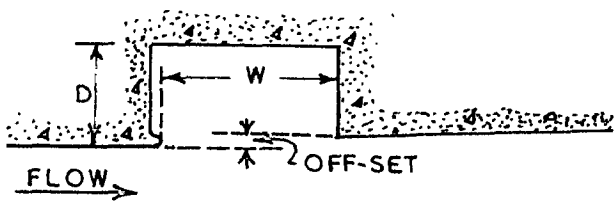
SLOT WITH OFF SET DOWN STREAM CORNER AND PARALLEL DOWN STREAM WALLS
